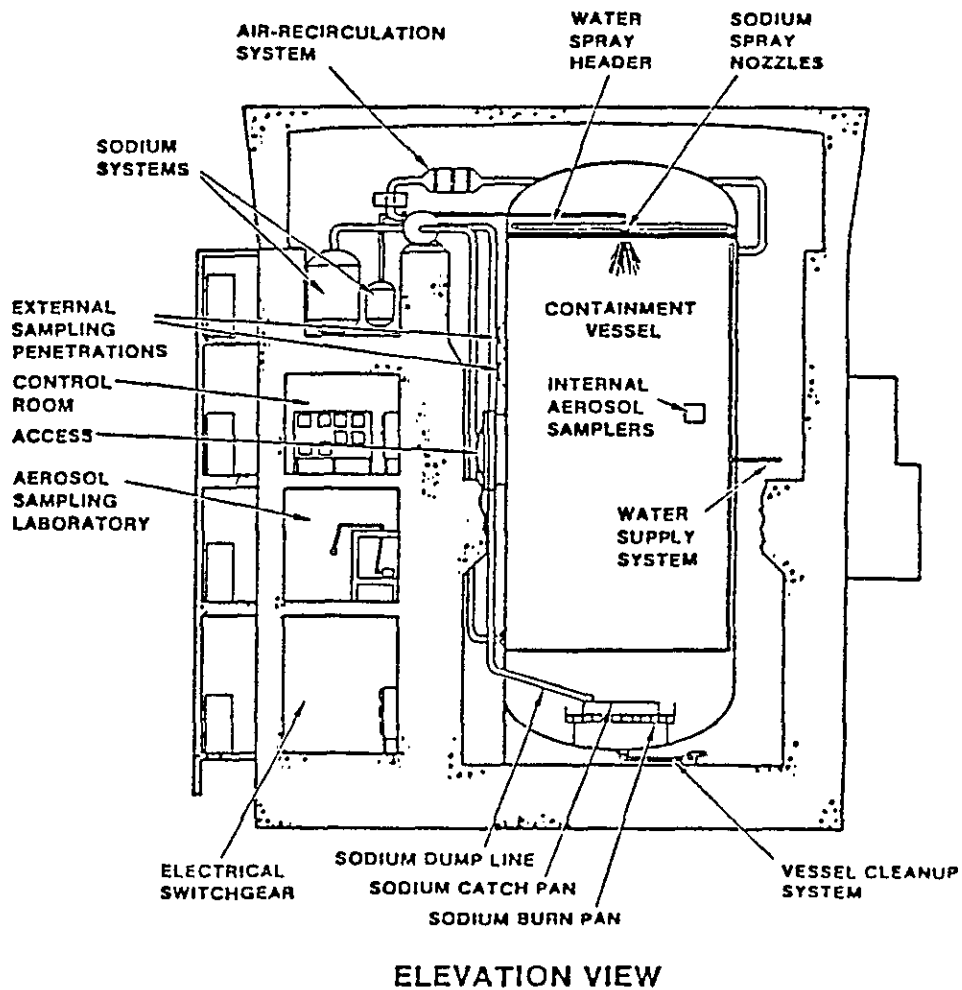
221-T CONTAINMENT SYSTEMS TEST FACILITY
